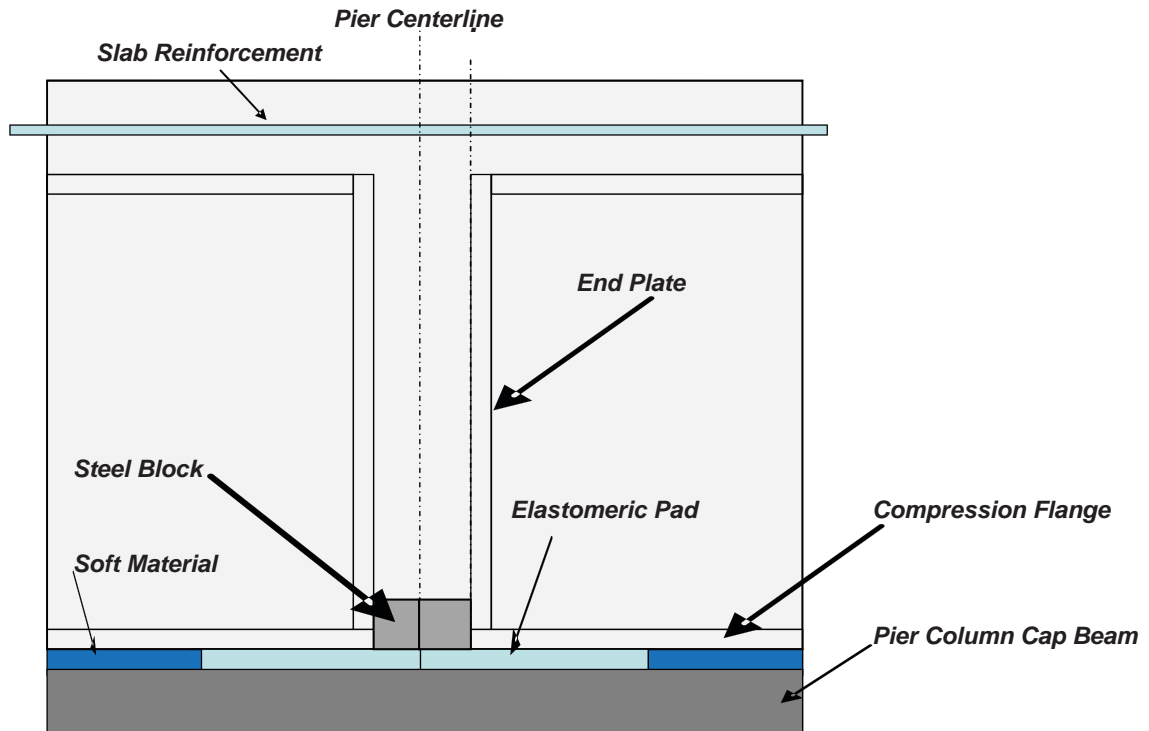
Concrete diaphragm detail over the pier for conventional methods of construction.
